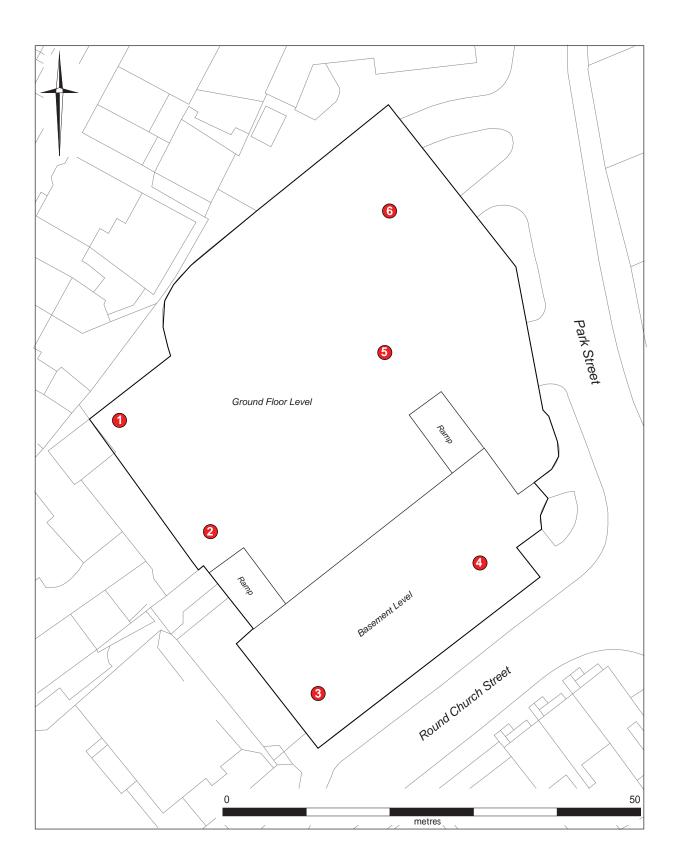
Park Street Multi-storey Car Park, Cambridge: Plan of development area showing location of boreholes 1-6
